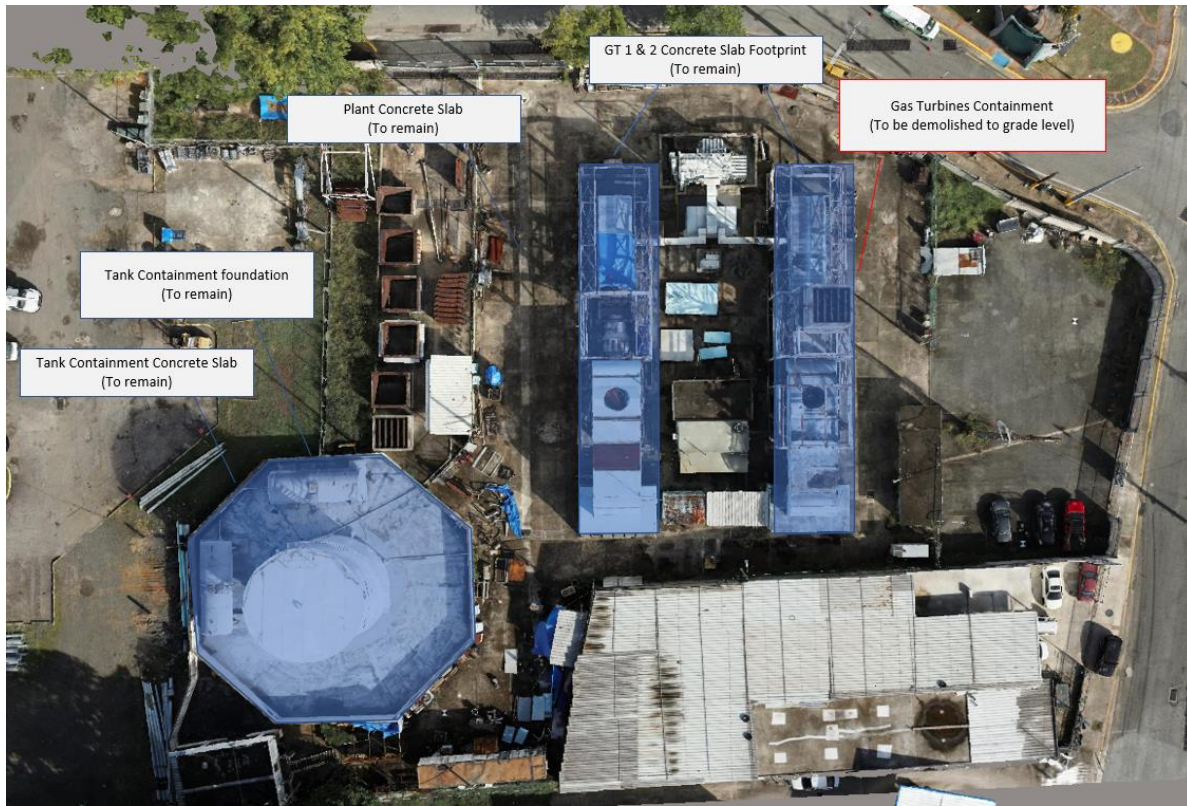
Plant Materials, Equipment and Structures to be Demolished
